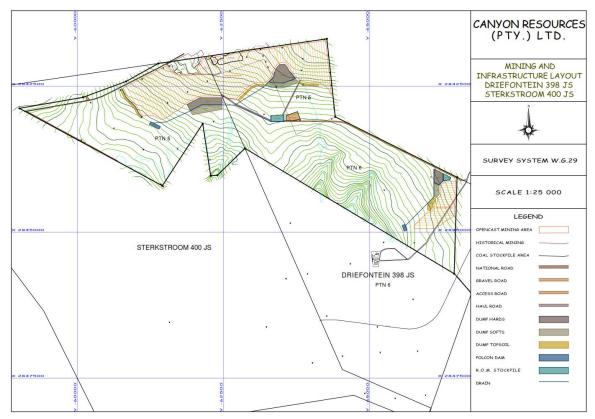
Proposed Infrastructure layout (provided by uKhozi, 2022).
